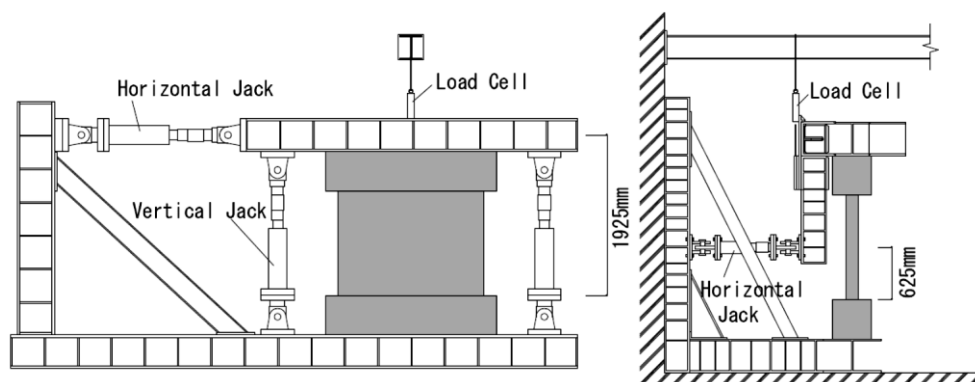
Details of tested wall specimens (Kabeyasawa et al. 2014)
